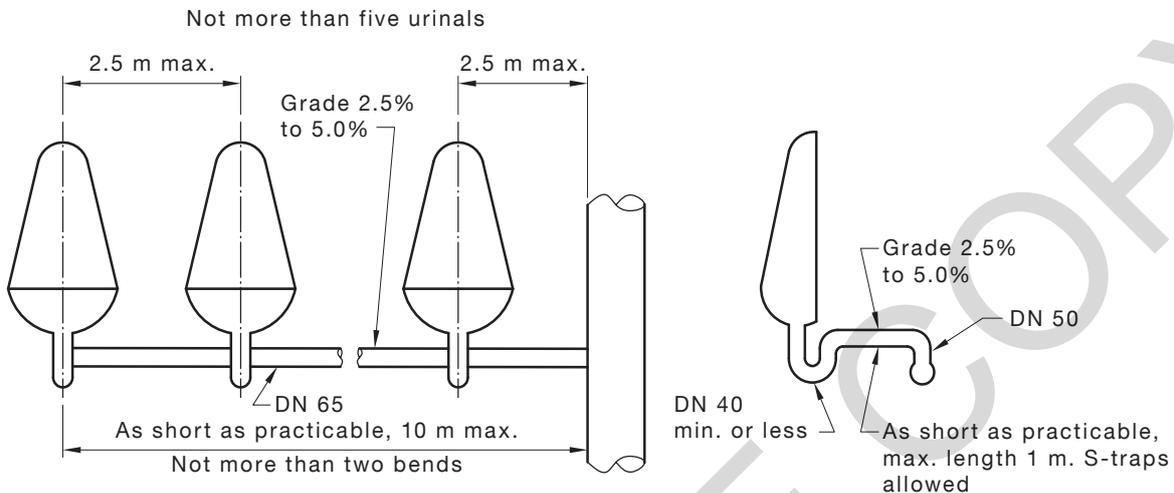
CONNECTION OF WALL-HUNG URINALS
